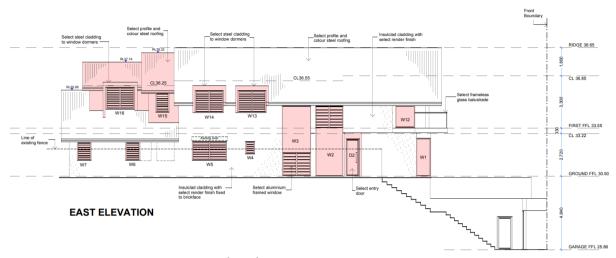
East (Side) Elevation, Sheet No. 7 Dated 19.01.2022
